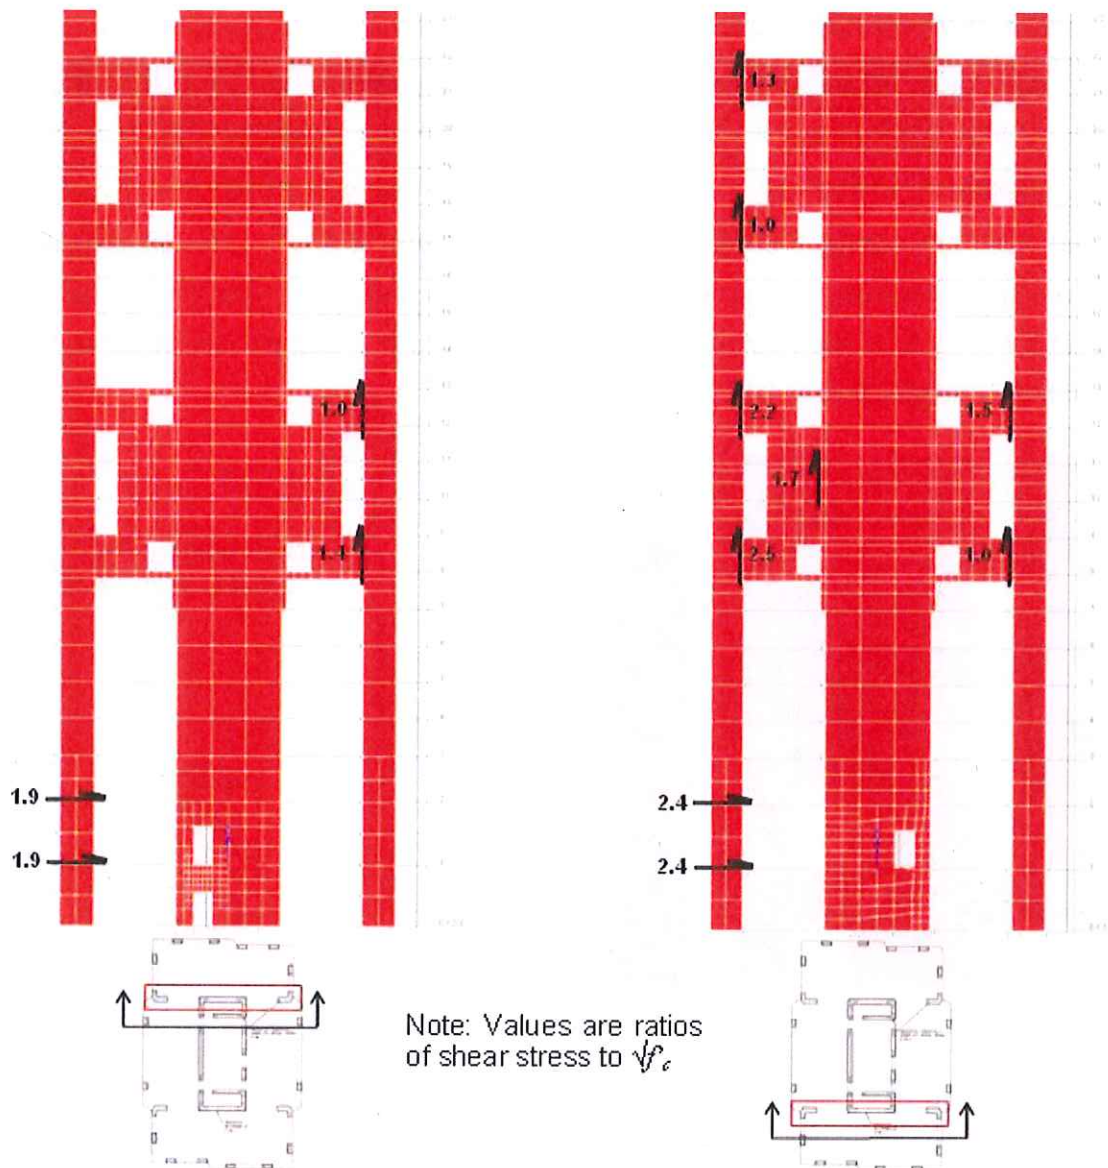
Shear wall stress exceeding  $\sqrt{f'_c}$ , north and south core walls and outriggers
